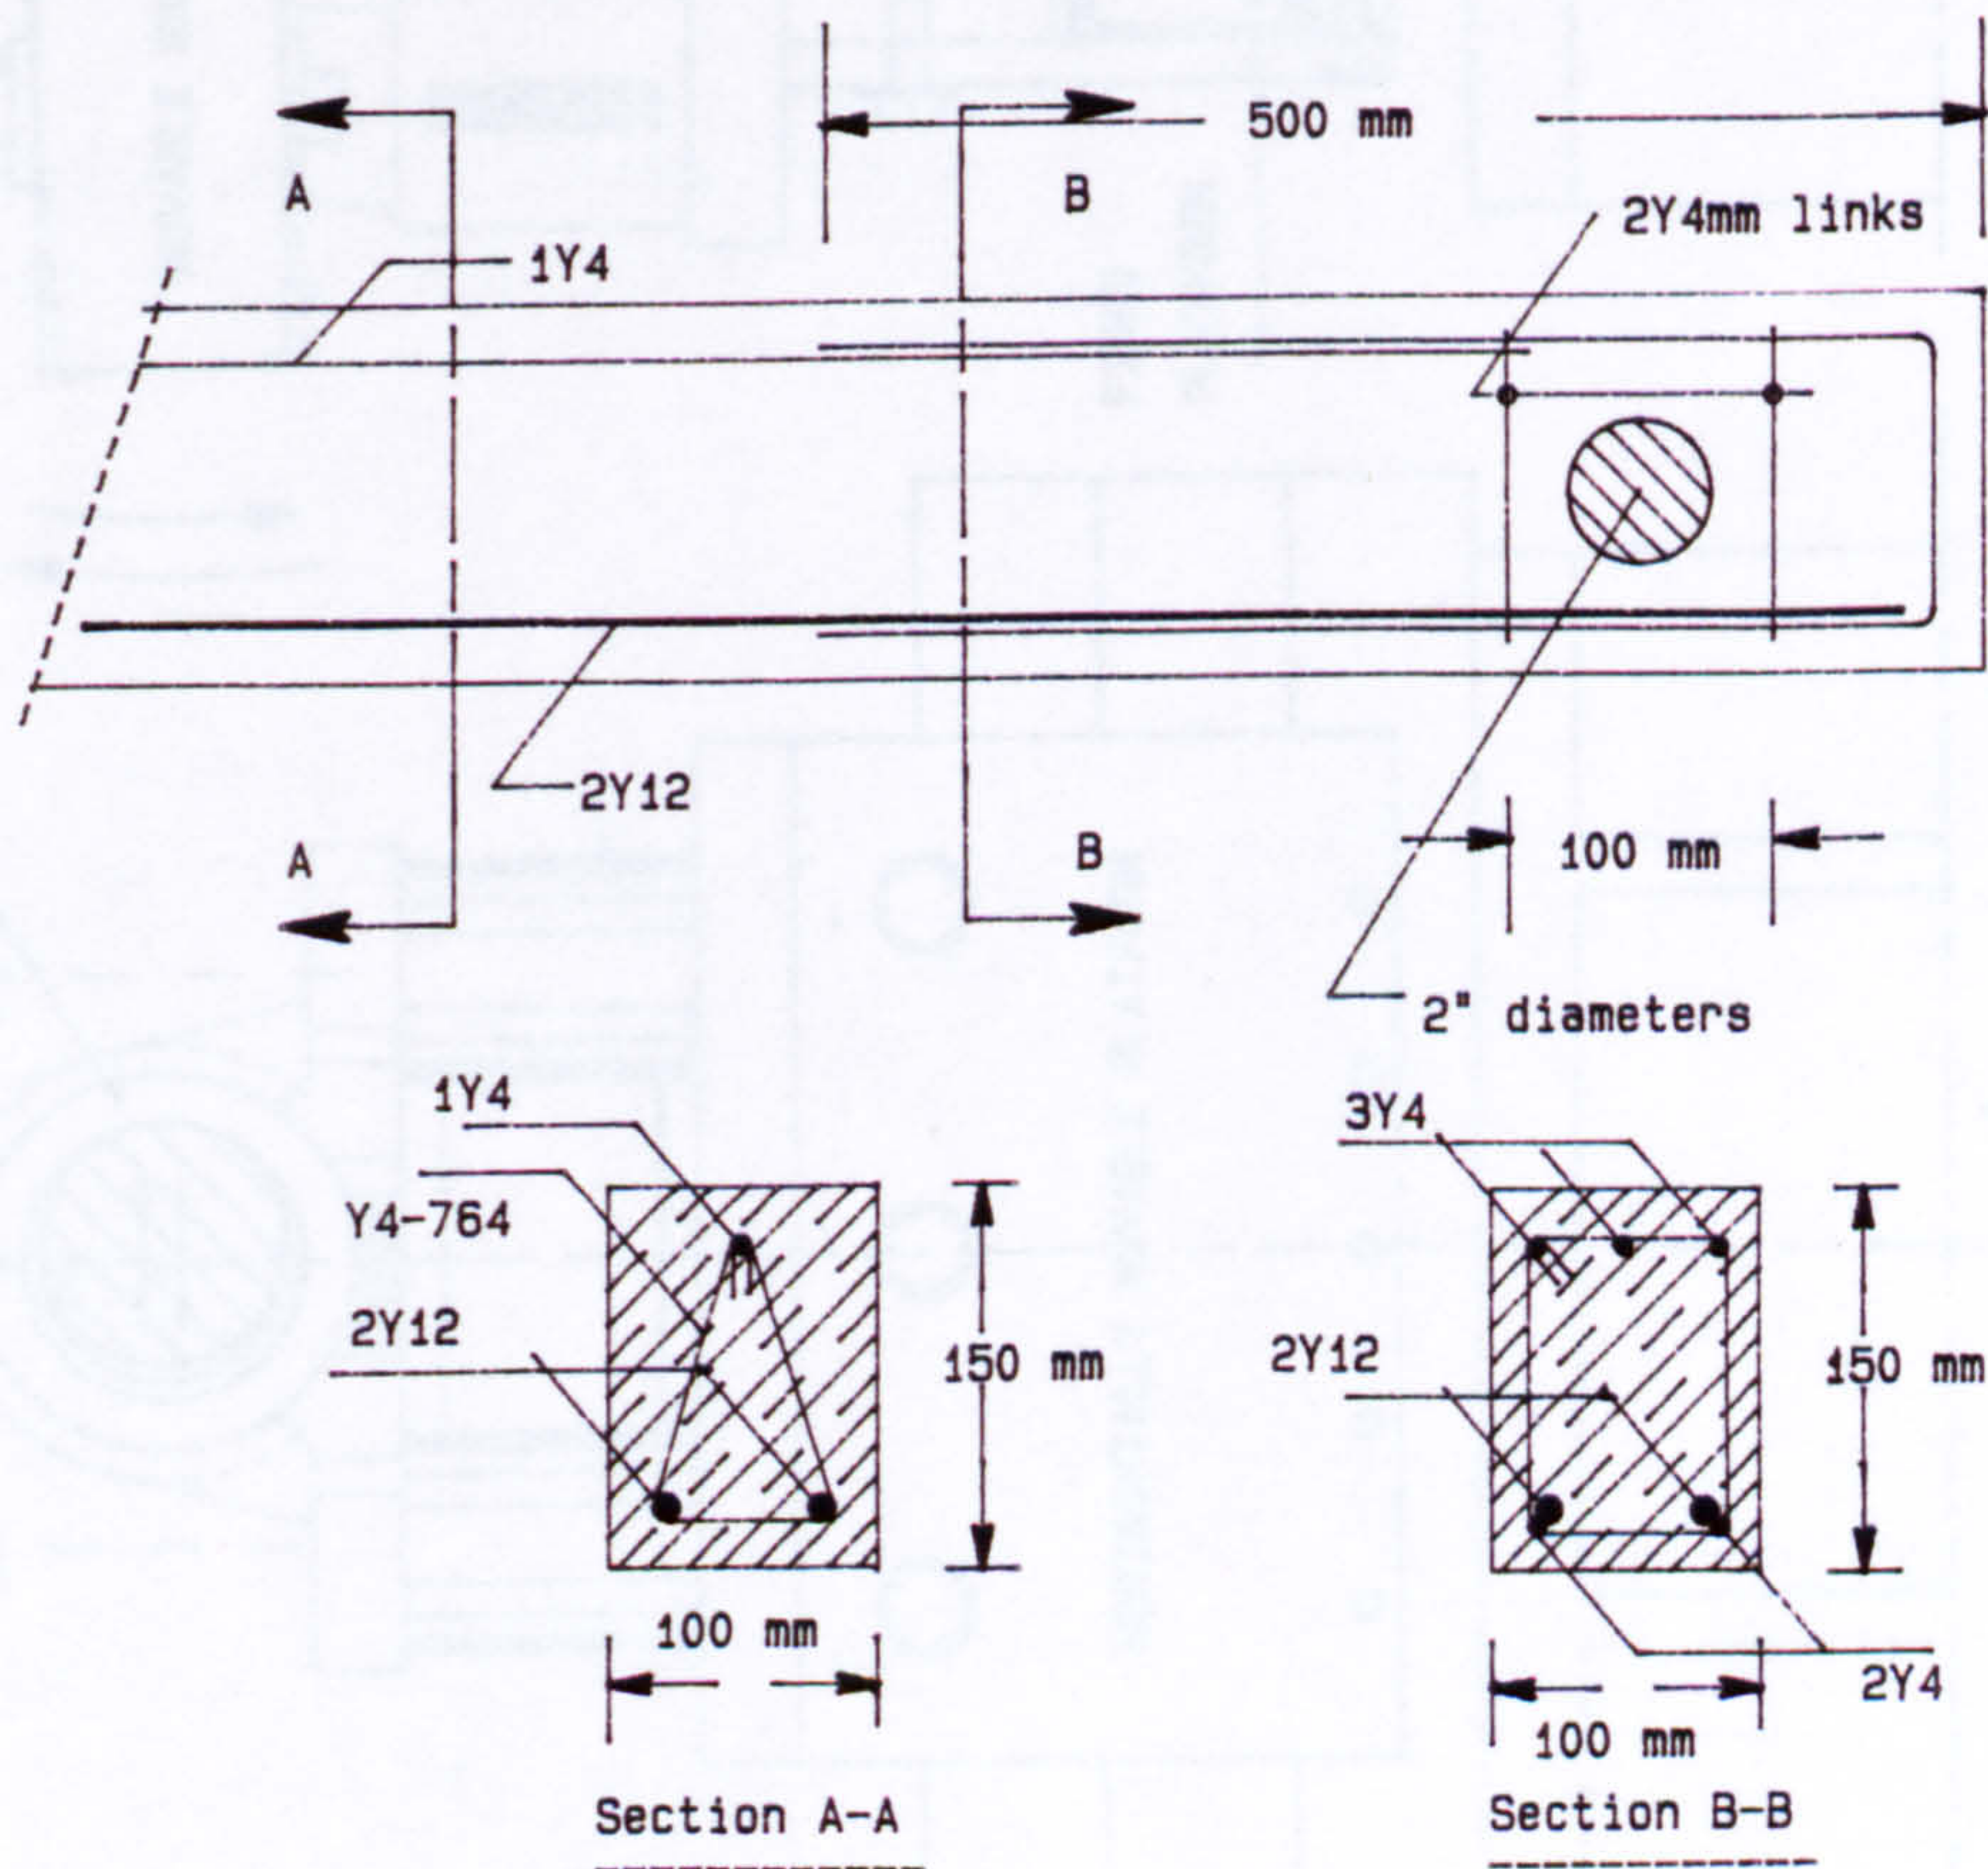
TYPICAL DETAILS OF REINFORCEMENT.
